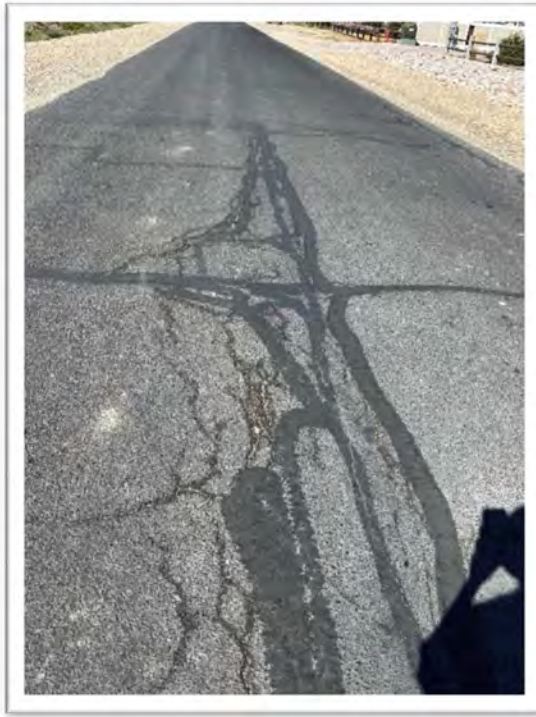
Additional Fatigue Crack Sealing with Recent Cracks
